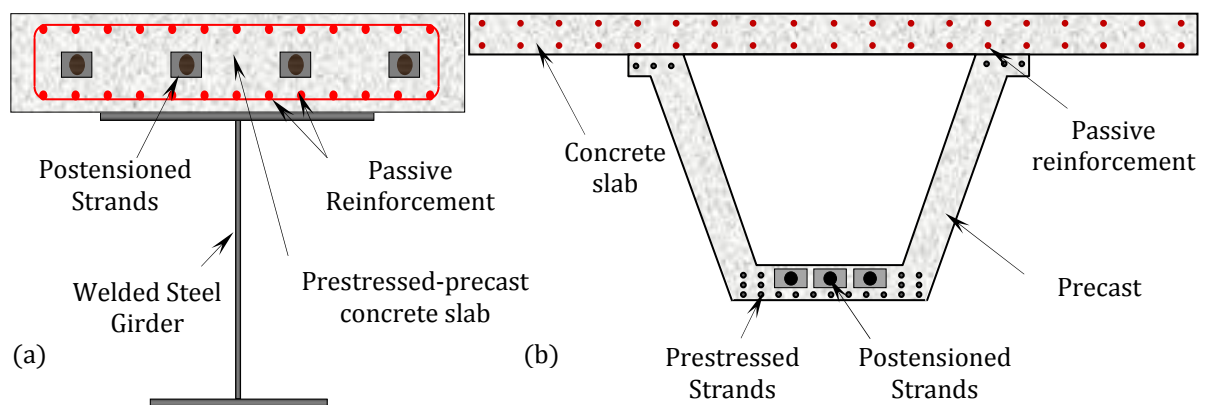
Composite sections: (a) with a prestressed concrete slab; (b) precast pre and postensioned girder.
